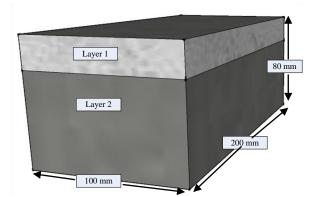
Double Layer Rubberized Concrete Paving Block (DL-RCPBs)
